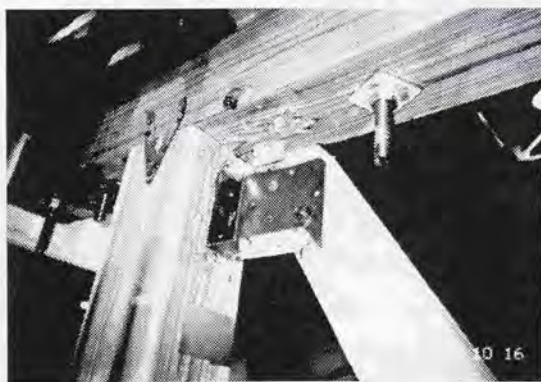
4. The failure of the upper bracing joint caused by the breaking or the pull-out of wood screws.
